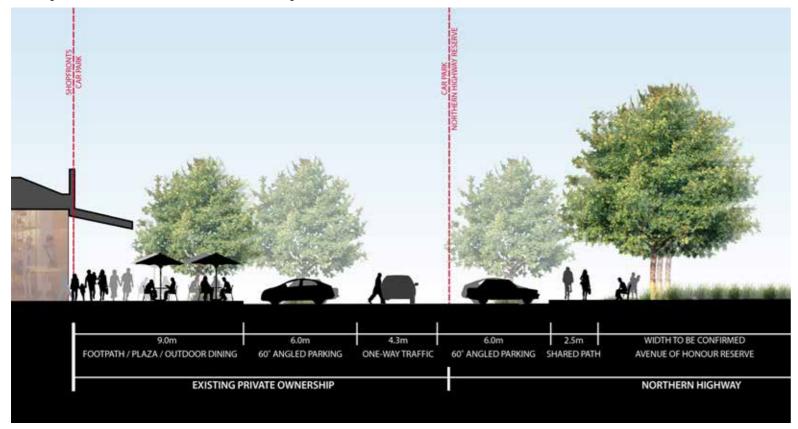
Proposed Retail Cross Section - Option 1 - Improvements within Private Land
